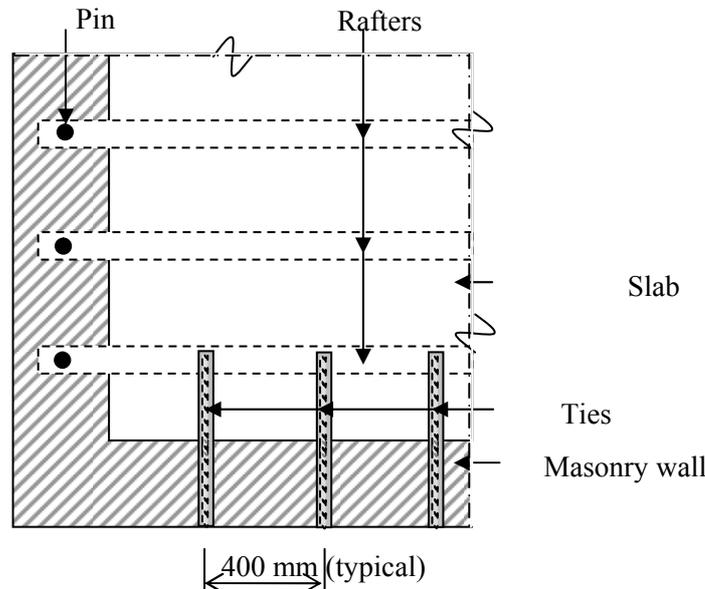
Typical strengthening of a slab-to-wall connection at a corner.
